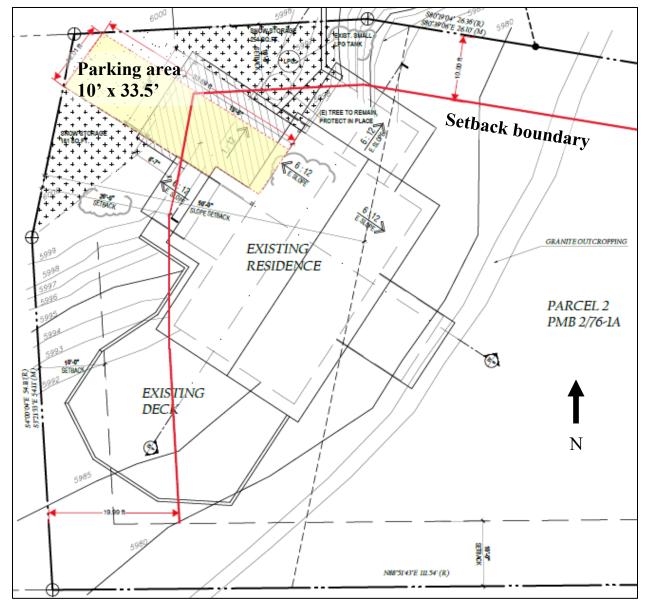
Site plan of the property displaying the current parking area and setbacks.
